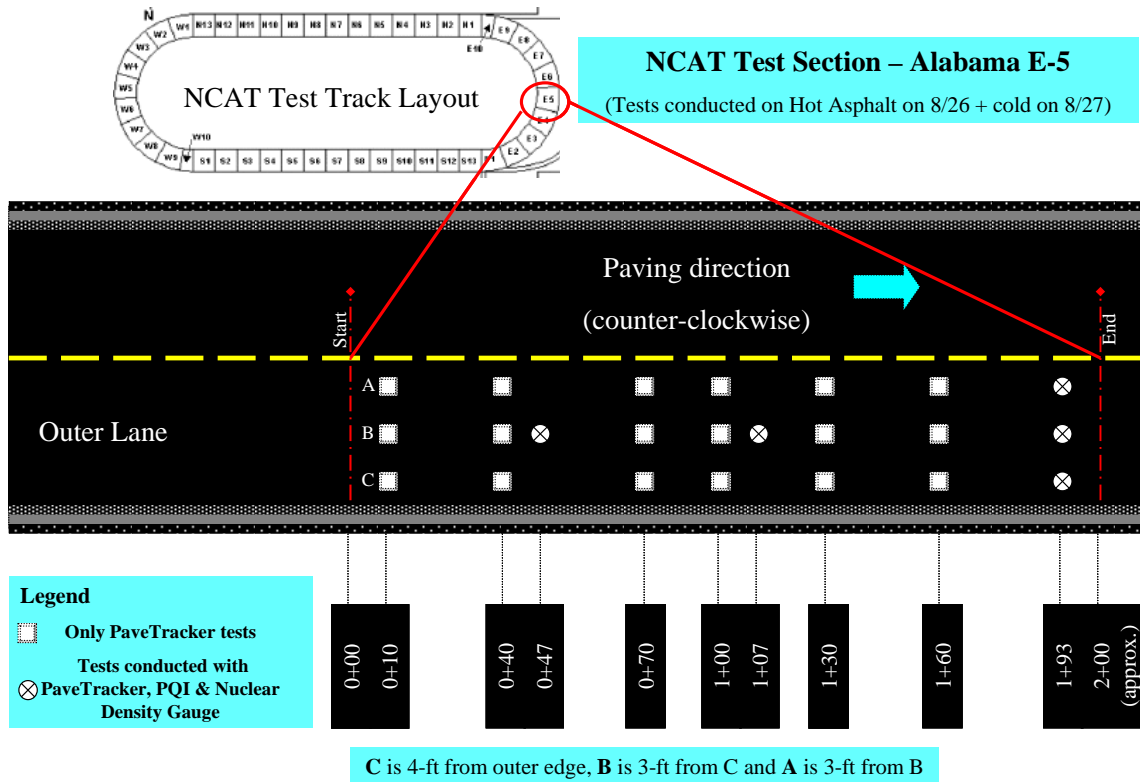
Test Point Layout Along the Alabama E-5 Test Section at NCAT (refer to Tables B.14 and B.15)
